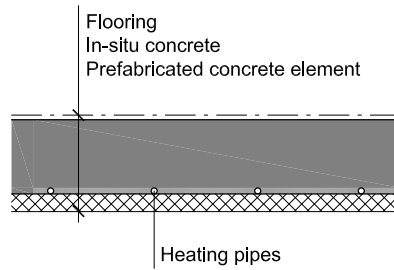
Position of the heating pipes of TABS in an intermediate concrete floor structure.
